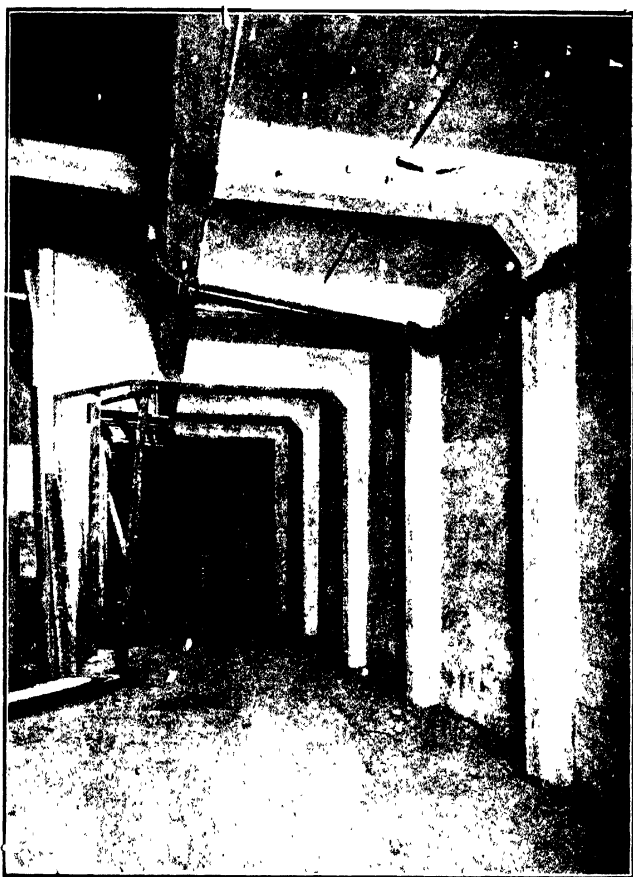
Vault under pavement, warehouse, Stamford Street, S.E.
